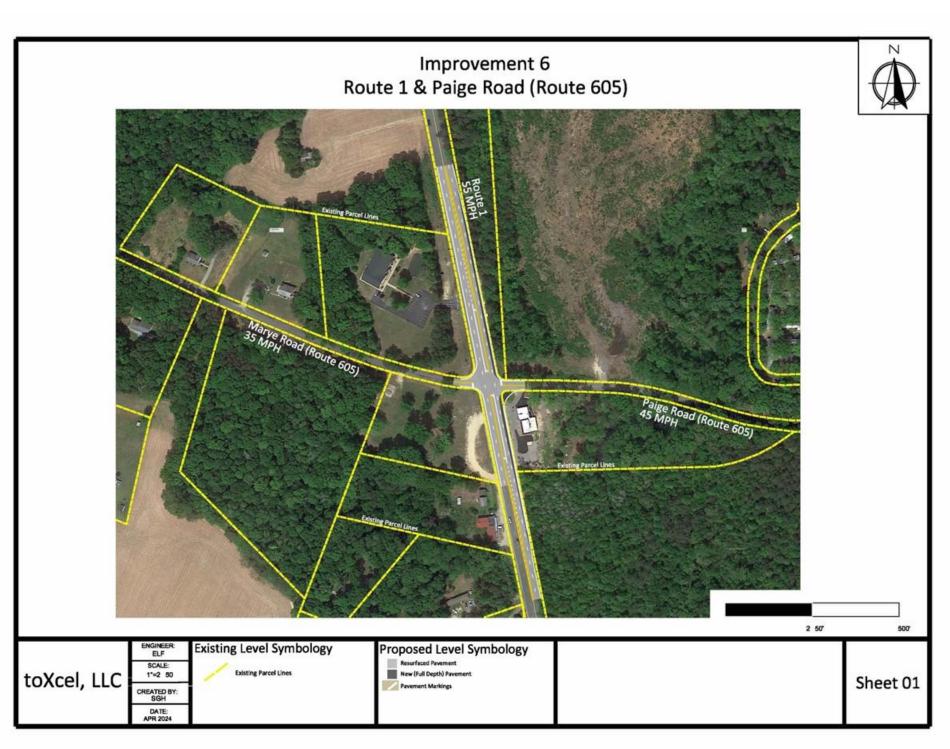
Route 605 (Marye Road/Paige Road) Improvements
